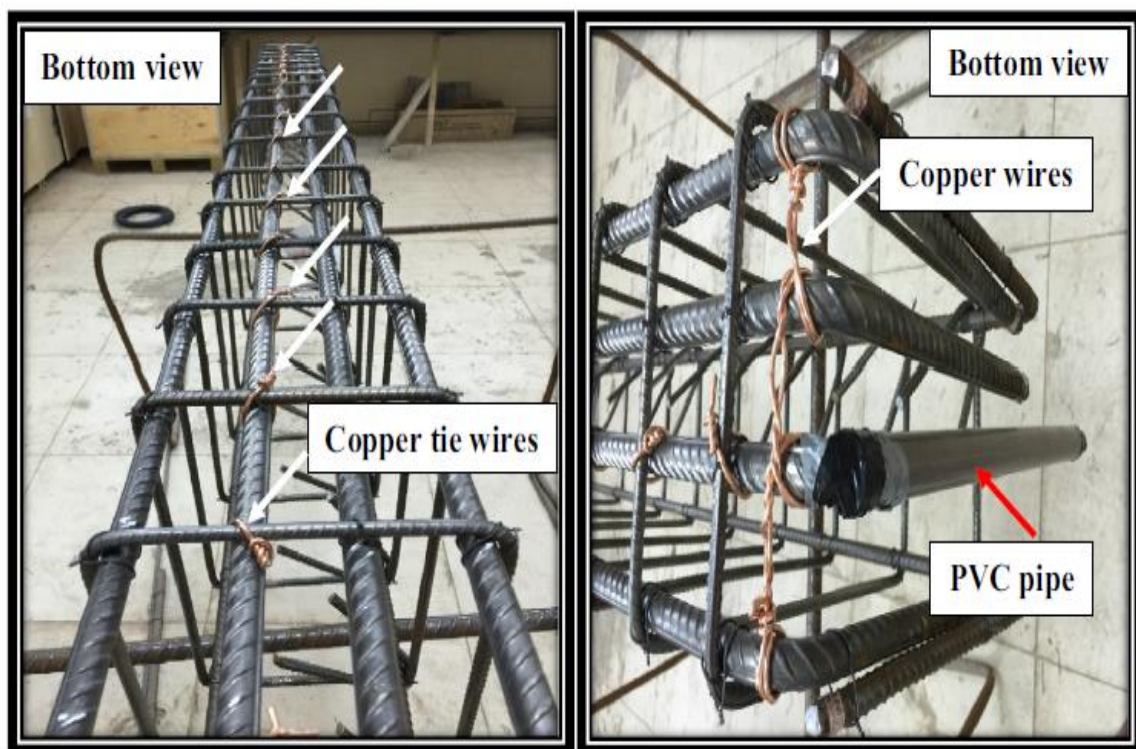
Copper wires used for transverse and longitudinal bars.
